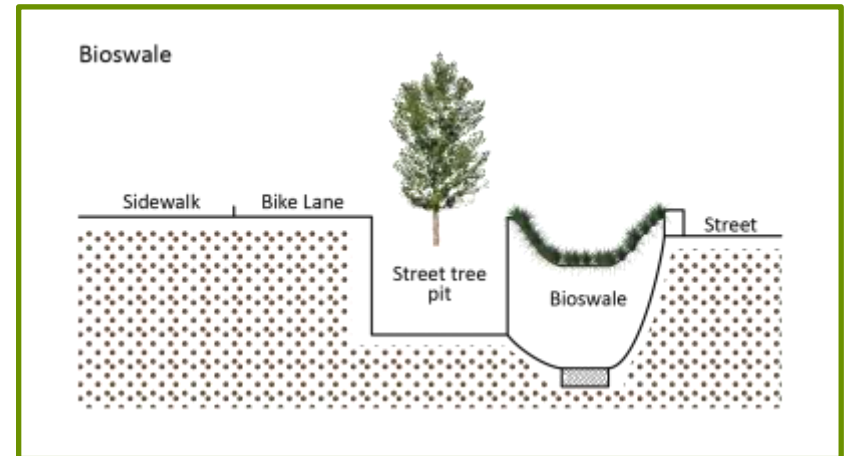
Scenario 5 LCCA Project Plan View Cross-Section View
